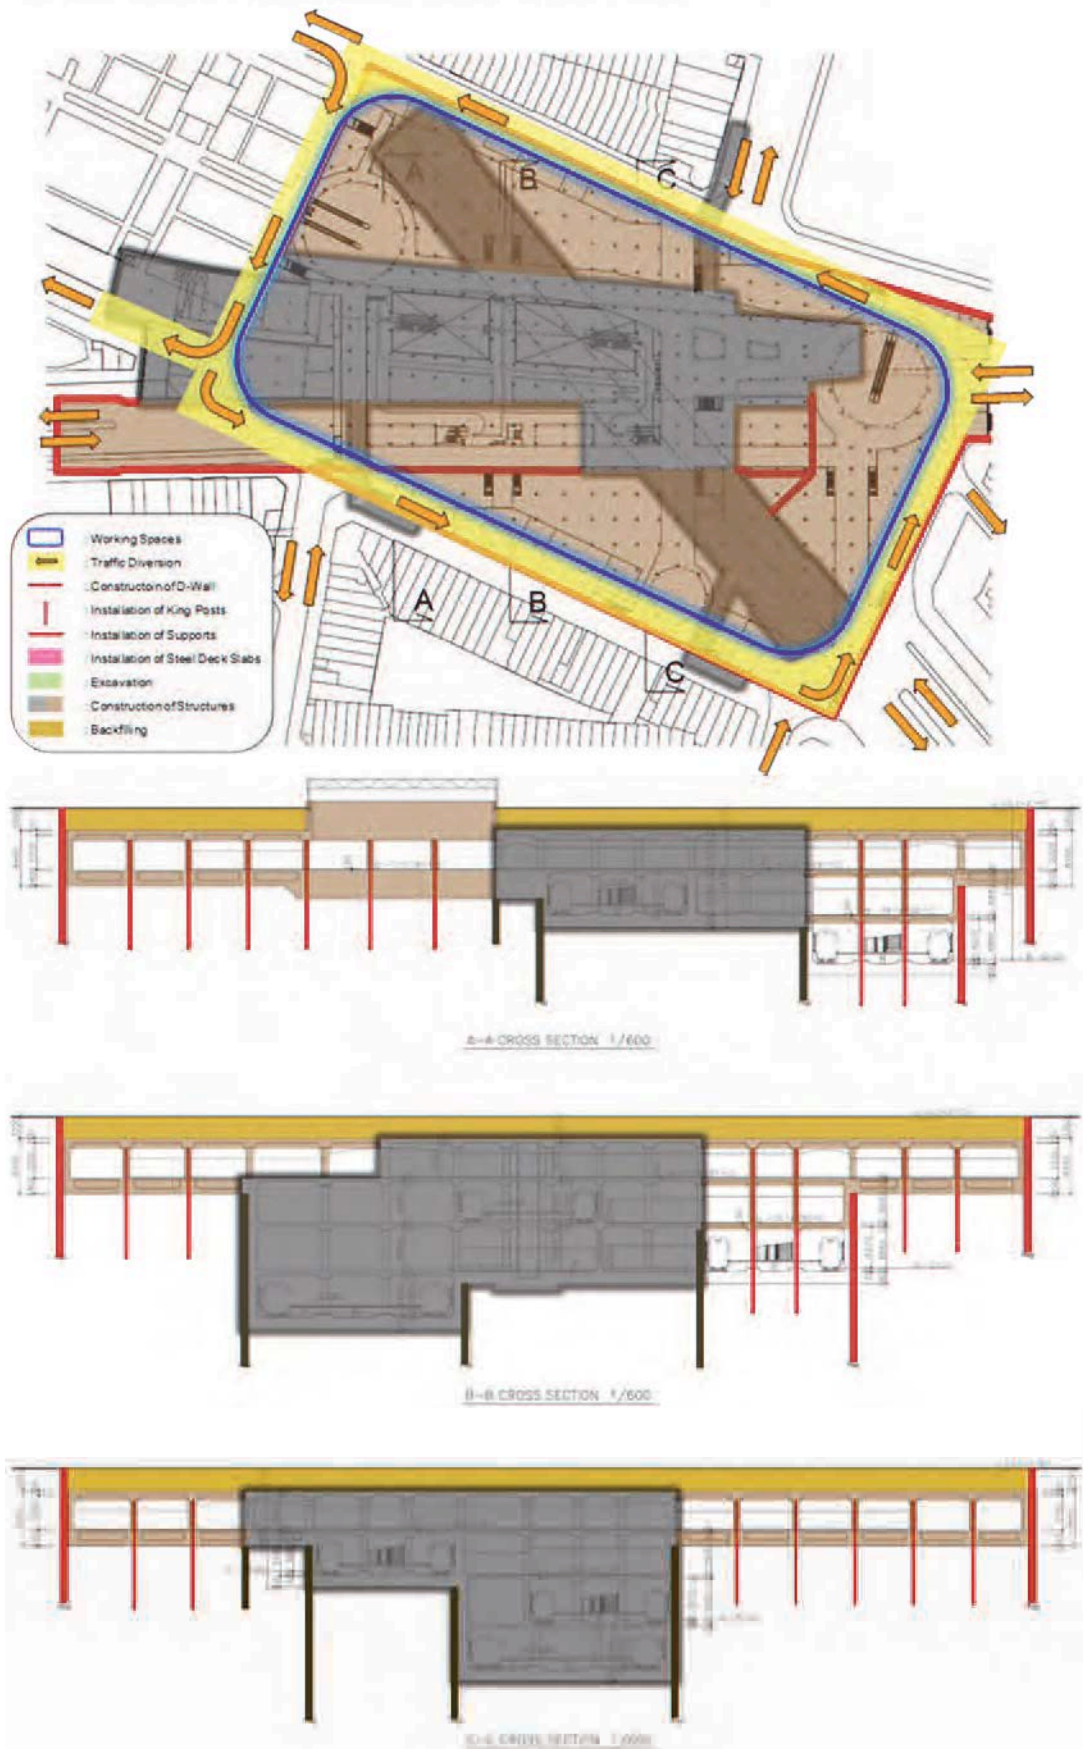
Construction Sequences of Ben Thanh Central Station (22/24)
